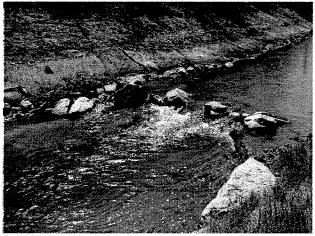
Looking downstream at log vane installed at MS Station 49+02, log toe protection, and root wad. (4/7/04)
